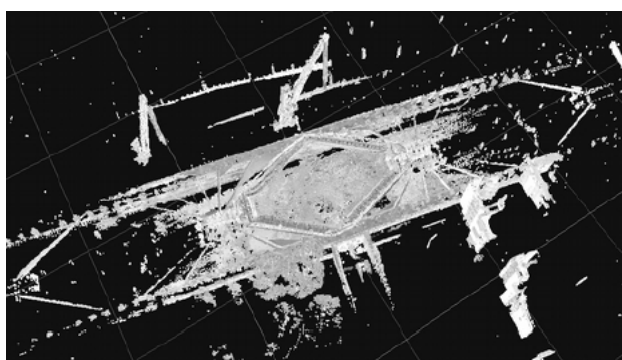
Underground railway station point cloud (partial) – February 2021 survey.
